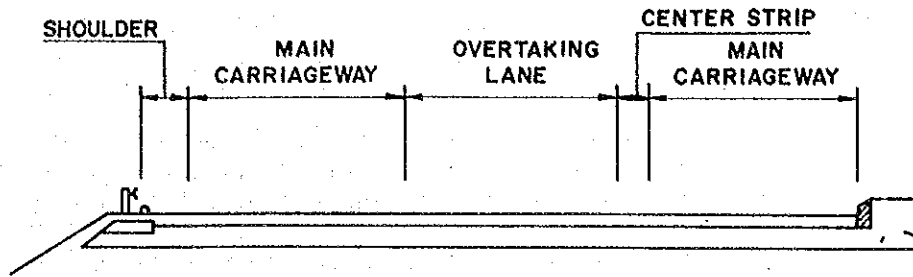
Typical Cross Section of Overtaking Lane Method
